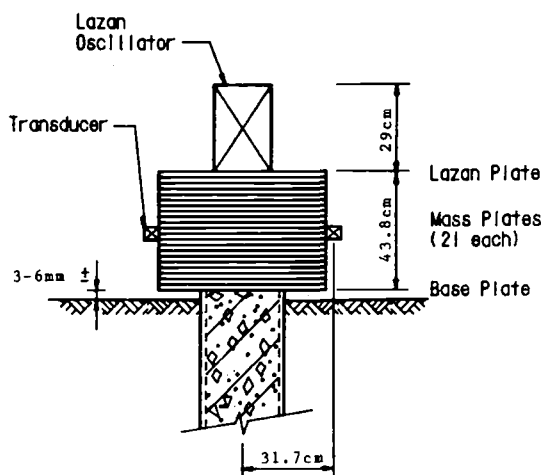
Typical cross section of a dynamic lateral-pile test.
